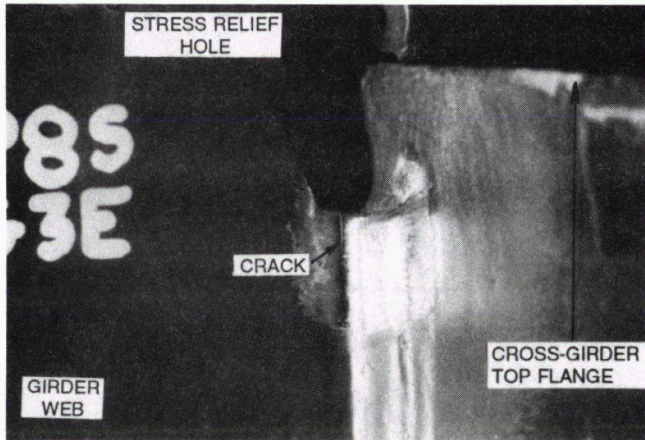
Typical crack at top flange stress relief hole.
